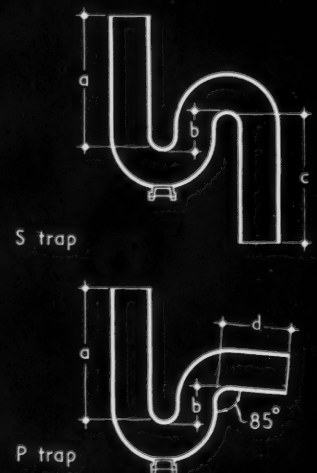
DETAILS OF STANDARD TRAPS FIXED TO DOMESTIC APPLIANCES.
